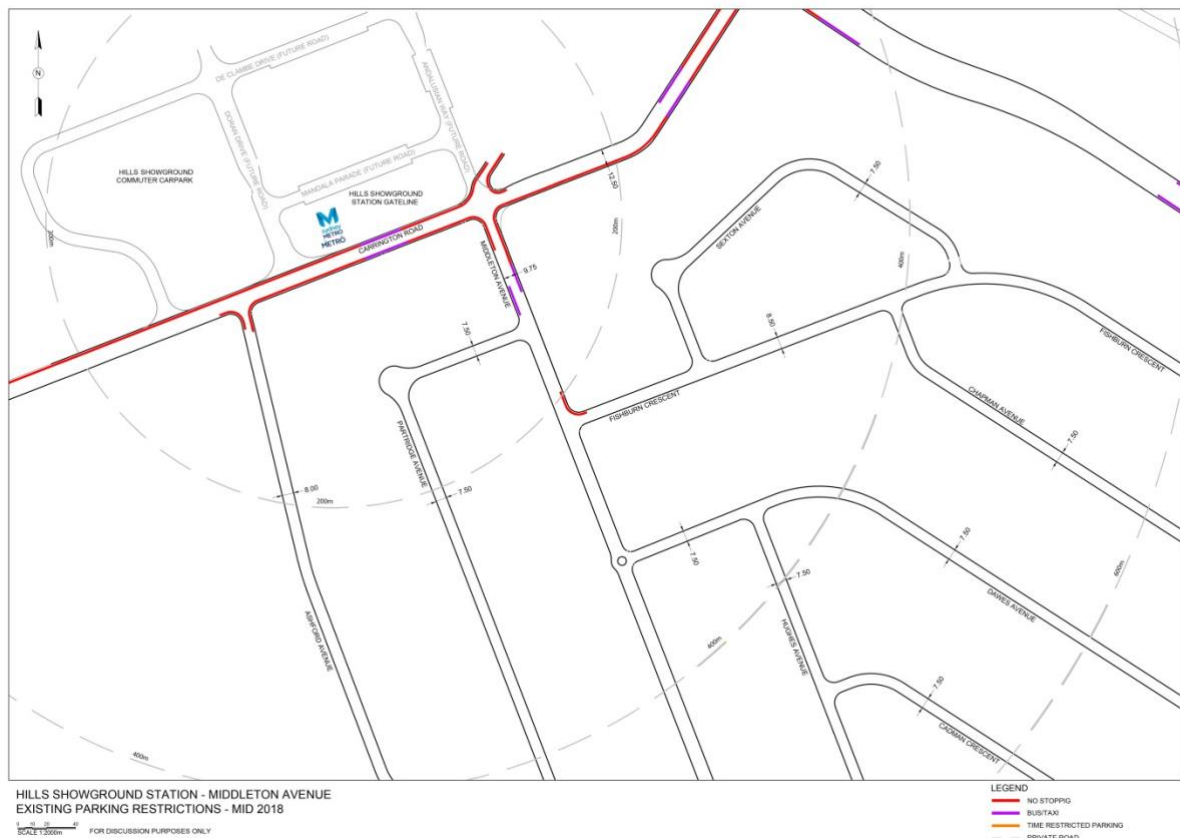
Pre-metro parking conditions mid-2018 – Middleton Avenue, Ashford Avenue and Partridge Avenue
